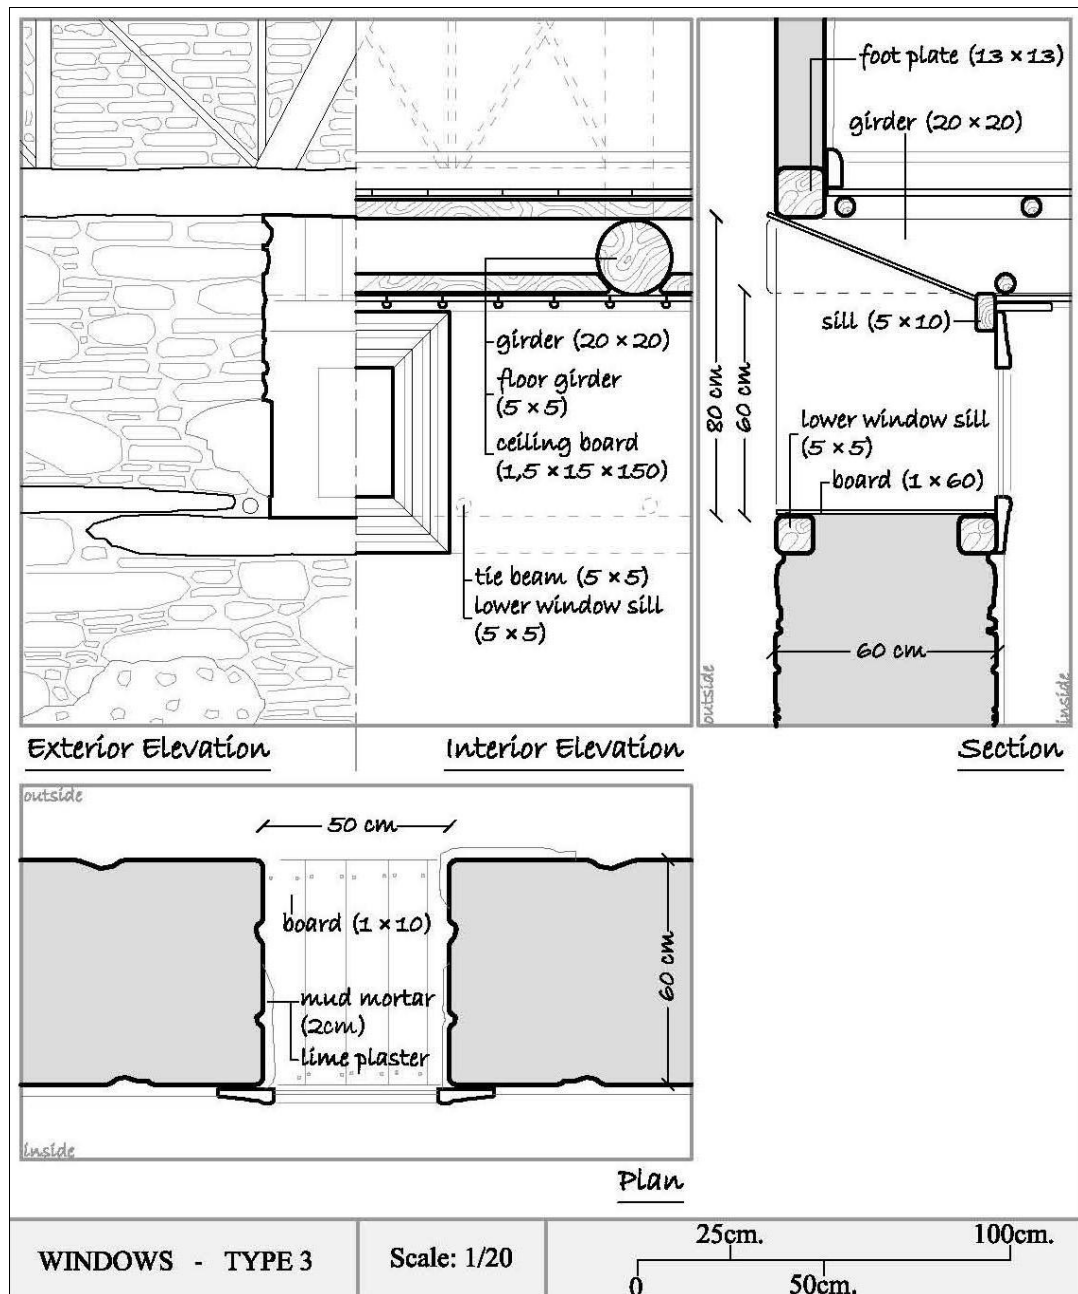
, Window openings Type 3 (Camikebir Quarter 3. Beyzade Street No:15)
